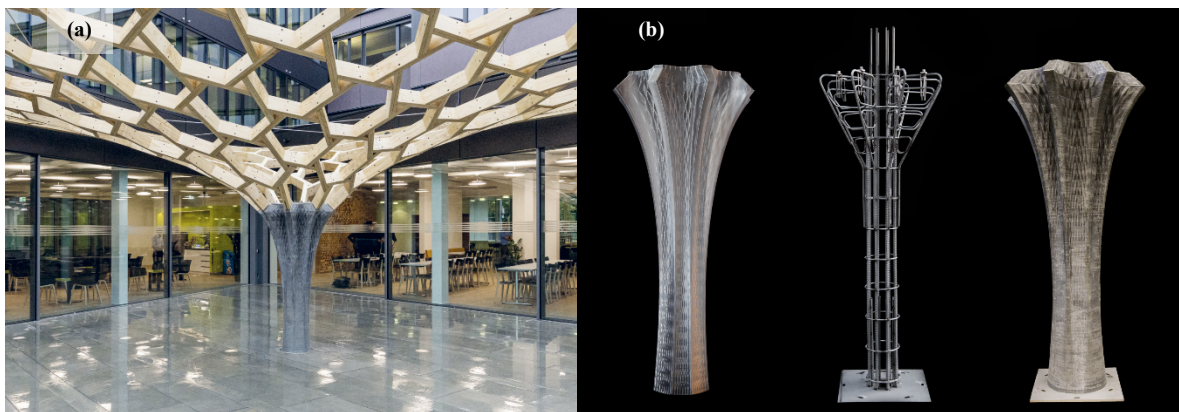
Future Tree pavilion in Esslingen, Zurich: (a) completed pavilion (Image: Basler & Hofmann AG, Stefan Kubli); (b) Eggshell column, from left to right, printed ultrathin formwork, reinforcement cage and finished concrete element (Image: Gramazio Kohler Research, Joris Burger).
